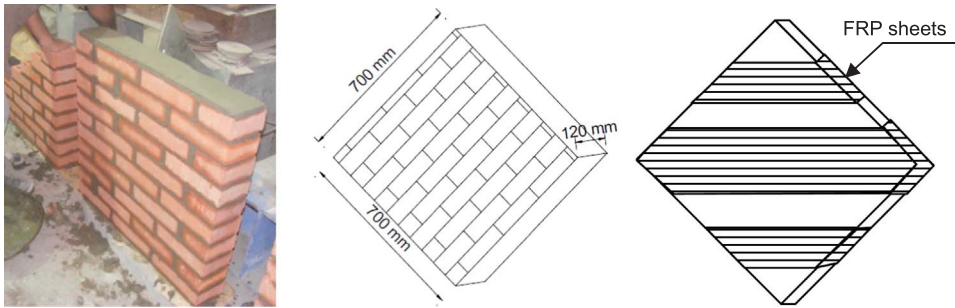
Masonry wallets dimensions and strengthening scheme.
